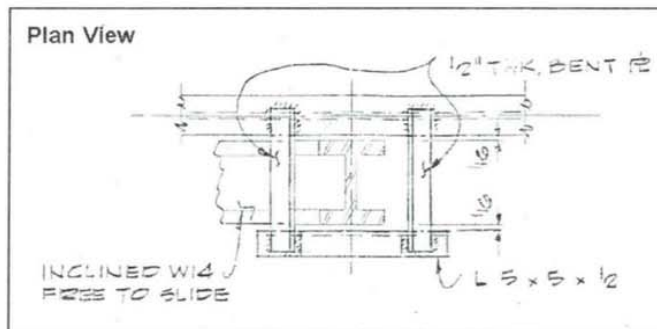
Original Collar Detail Shown on Cantor Structural Drawing (S-23)
